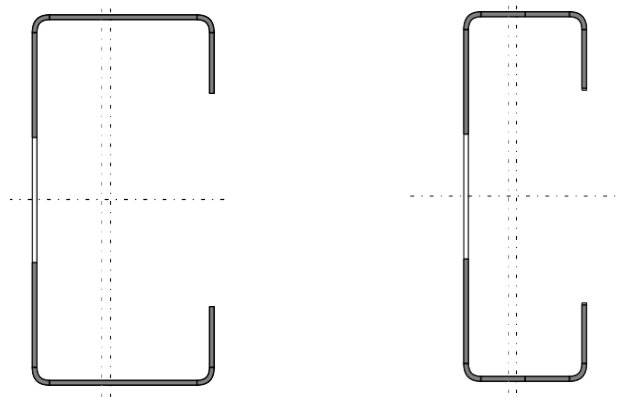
Studied cross-sections: Section A (left) and Section B (right).
